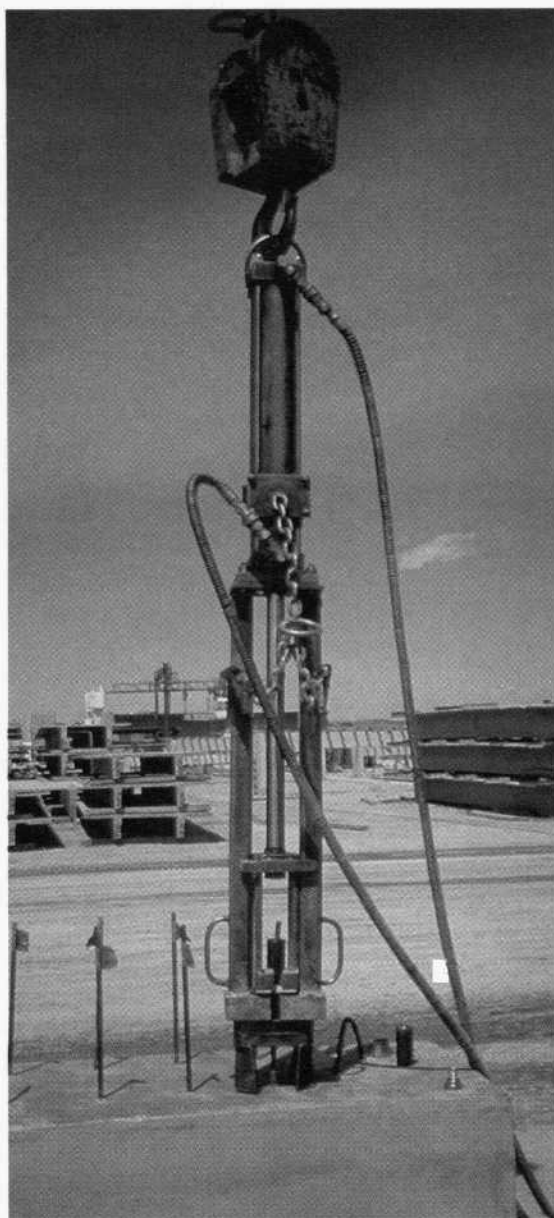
Pull-out load applied with single strand jack (preliminary pull-out test series).
